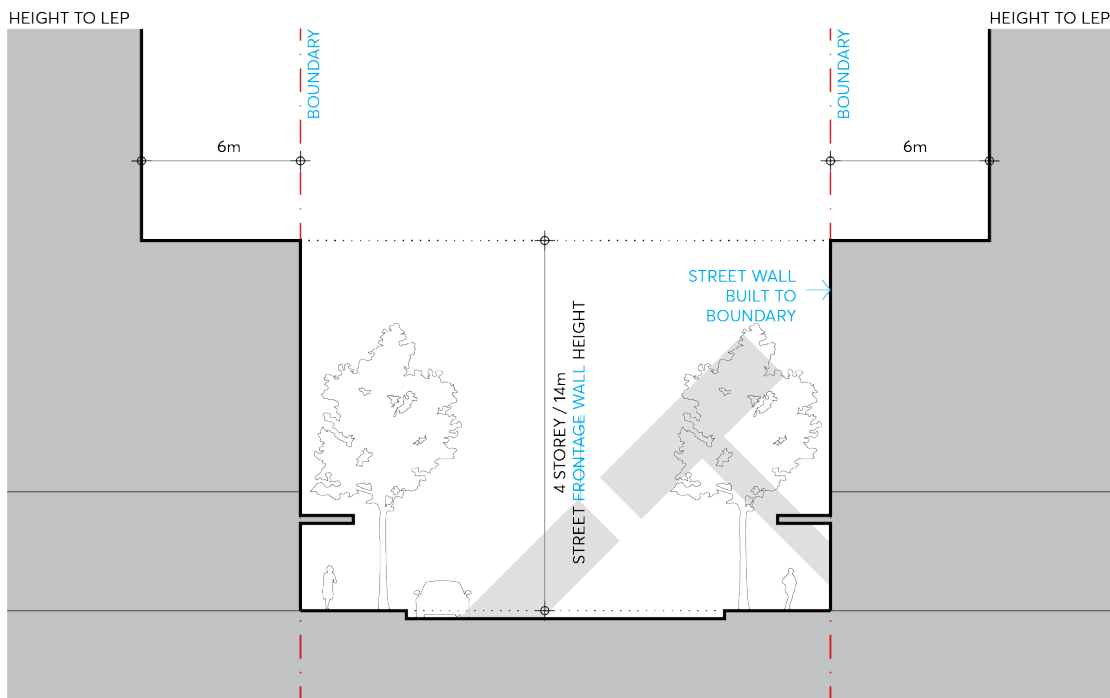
Park Edge Sensitive Area Street Wall Height and Setbacks
